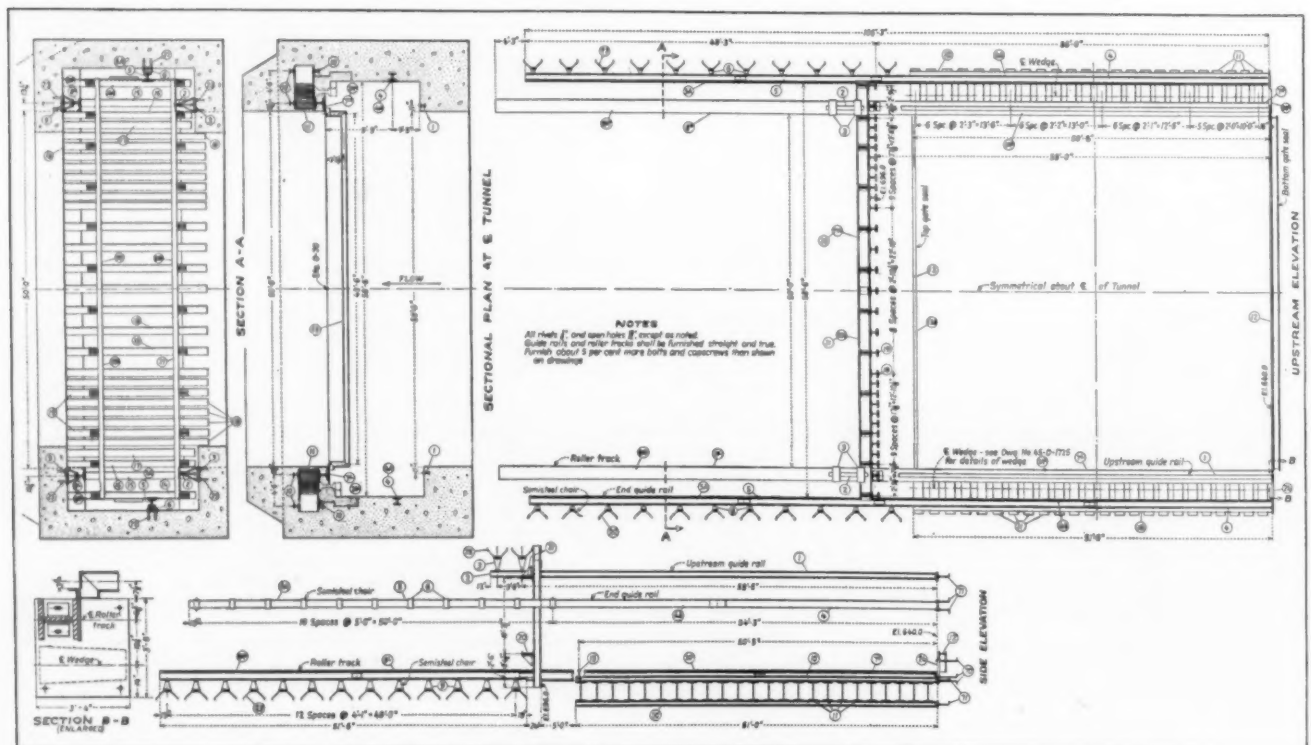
GATE-FRAME ASSEMBLY AND SECTIONS
